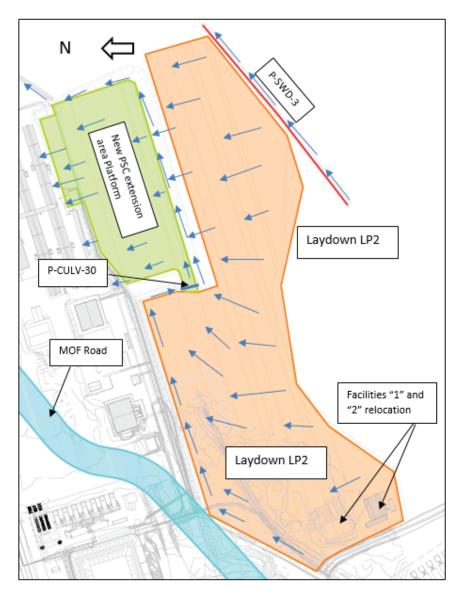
Laydown LP2 and PSC Extension Platform Drainage
